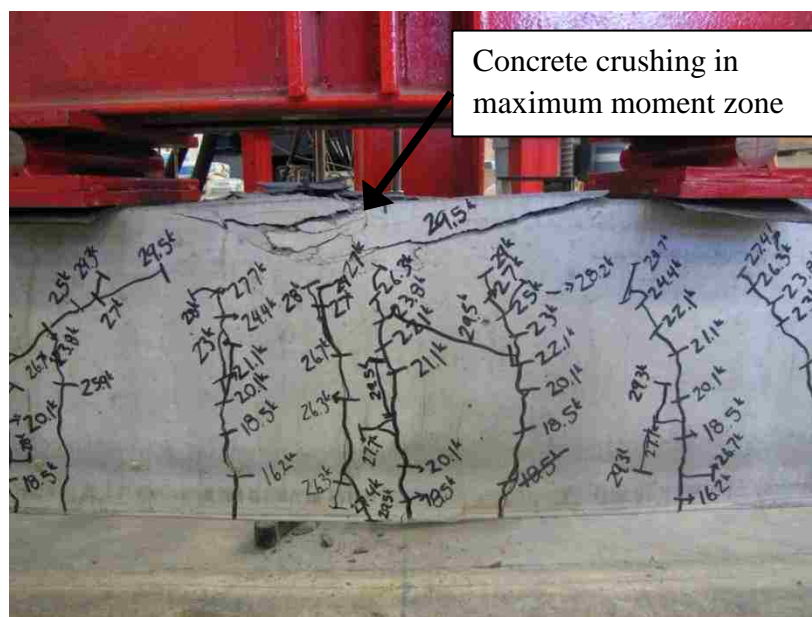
Typical Concrete Crushing Failure for Development Length Tests
